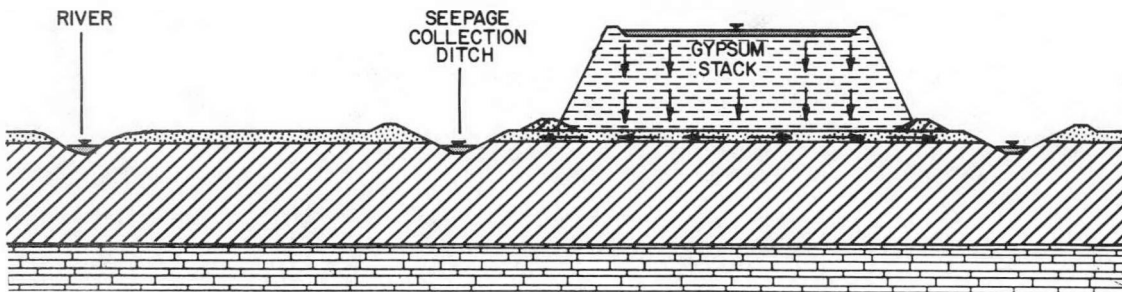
Perimeter Seepage Collection Ditch For Gypsum Stack on a Shallow Sand Foundation Overlying a Thick Clay Deposit
